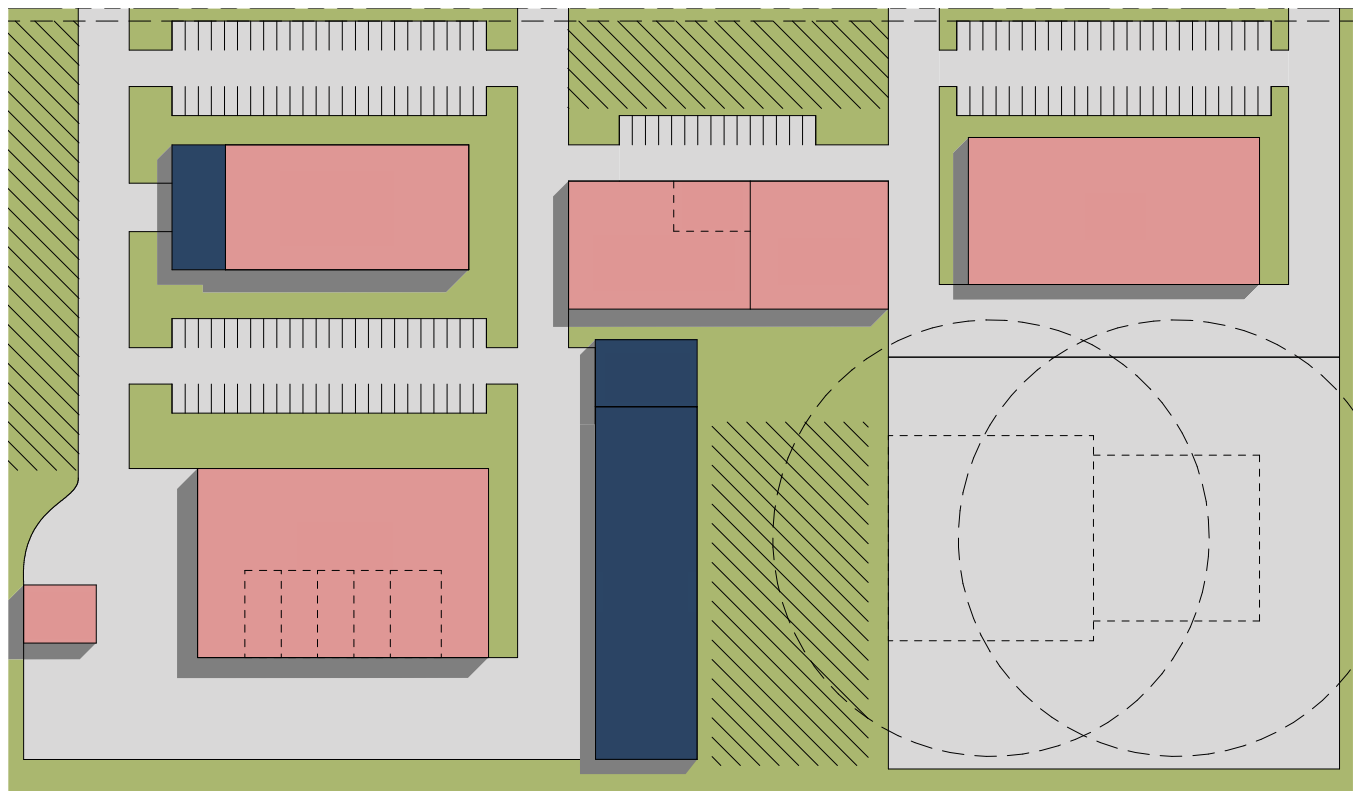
Theoretical site plan showing one consolidated site for support facilities
